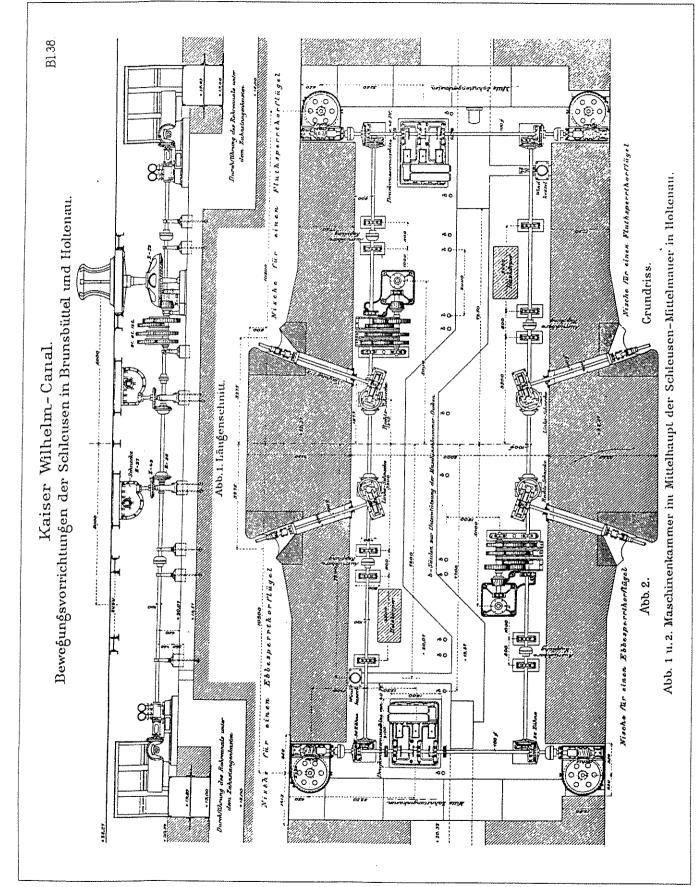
Kaiser Wilhelm Canal • lock machinery for Brunsbüttel and Holtenau
